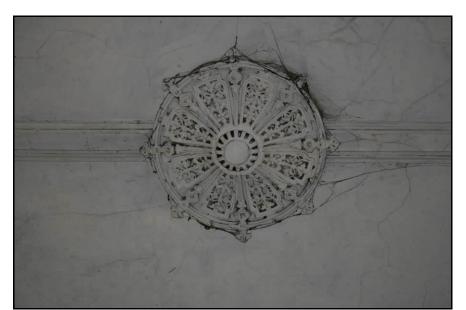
26 South Way, Newhaven: Ornate circular feature at north end of ceiling
